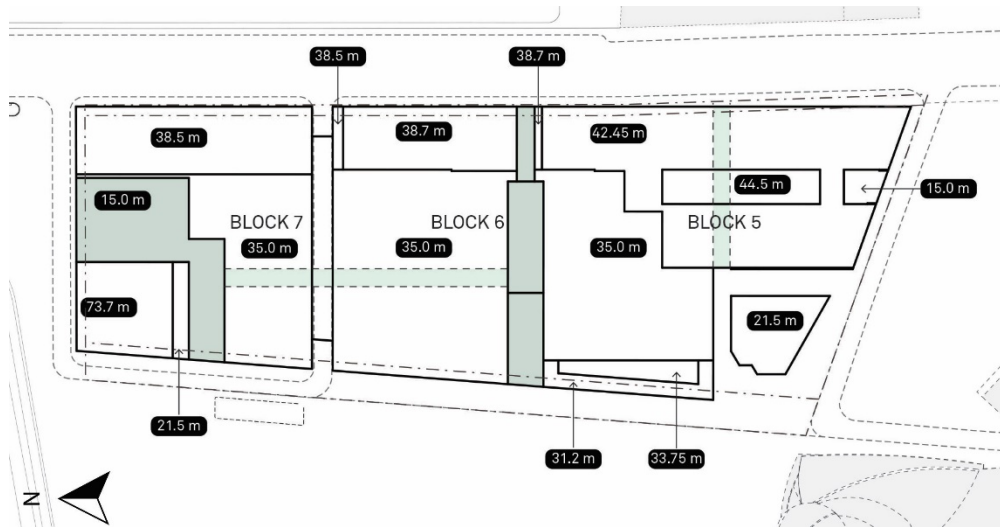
Central Barangaroo building envelope plan view. Source: Hassell 2021.
